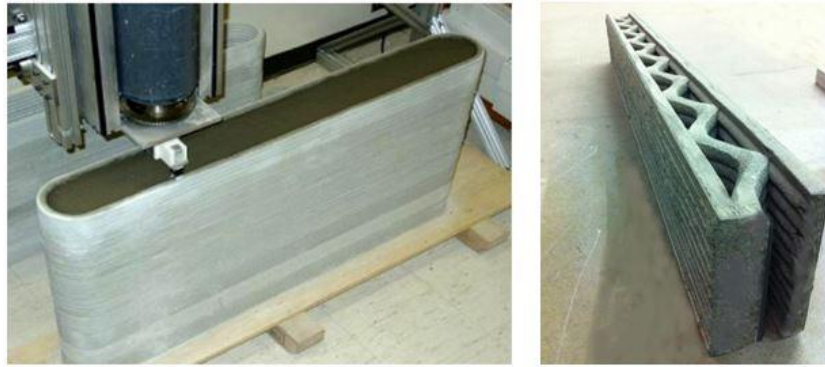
Concrete walls fabricated by using CC technology with manually poured core (left) and with reinforcement structure (right) [9, 10]
